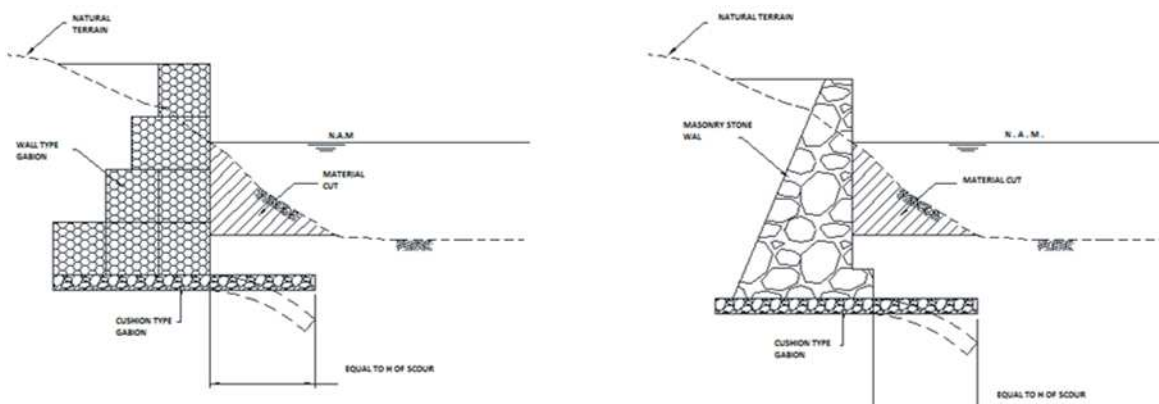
Types of protections for bank walls with slab protection. (SPOP, 2014)
